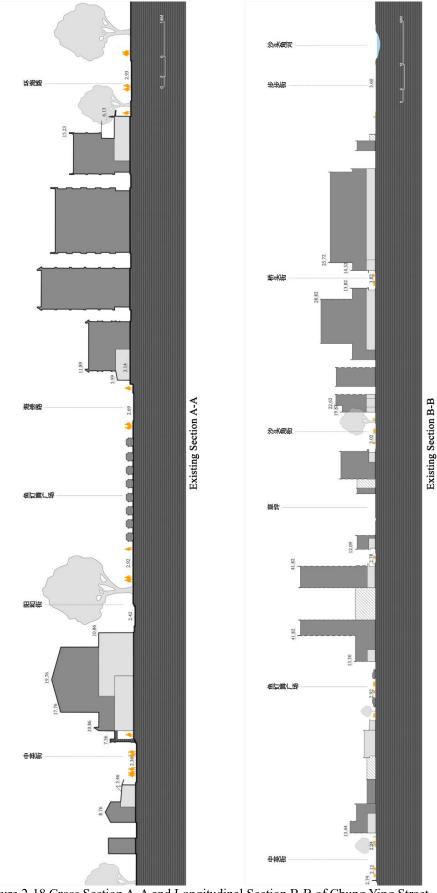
Cross Section A-A and Longitudinal Section B-B of Chung Ying Street (Source: Drawn by the Author)
